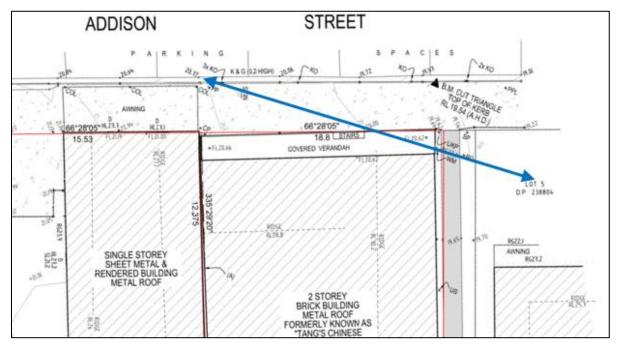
Existing line of sight between No. 29 and 35 Addison Street and public laneway
